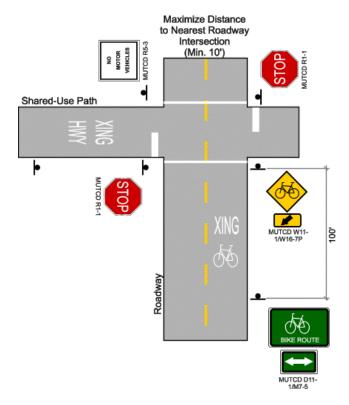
Multi-use Trail and Roadway Intersection Treatment³
